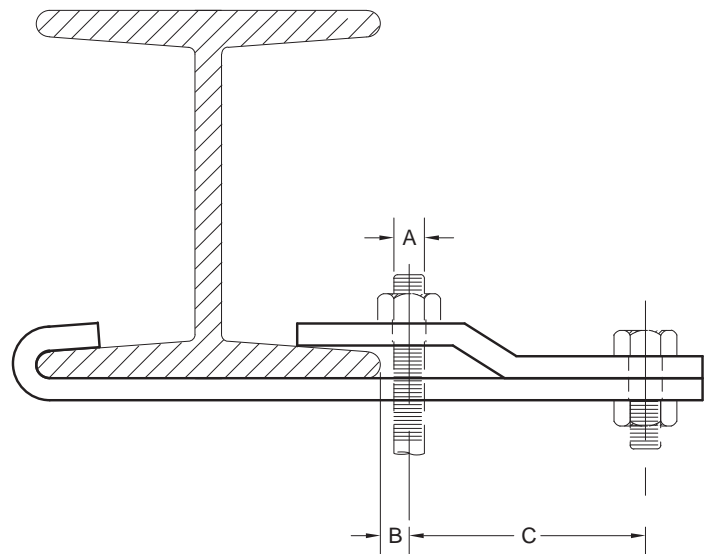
TOP OR SIDE BEAM CLAMP
